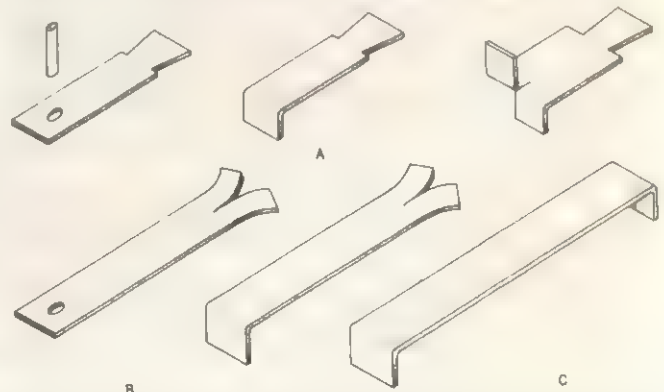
METAL TIES AND SUPPORTS USED IN PRODUCTION AND FIXING: (A) CRAMPS FOR FIXING STONE TO CONCRETE; (B) CRAMPS FOR FIXING STONE TO BRICKWORK; AND (C) GENERAL-PURPOSE STANDARD CRAMP
